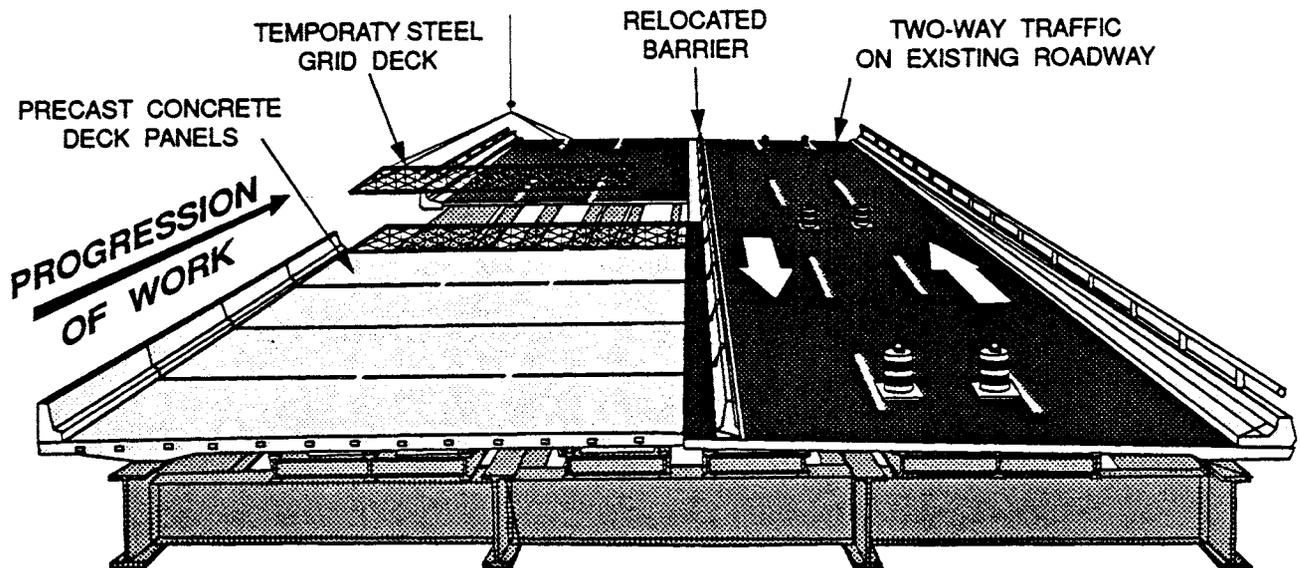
Precast, post-tensioned lightweight concrete deck panels were installed at night to replace the deck of the Woodrow Wilson Bridge (19, 68).
